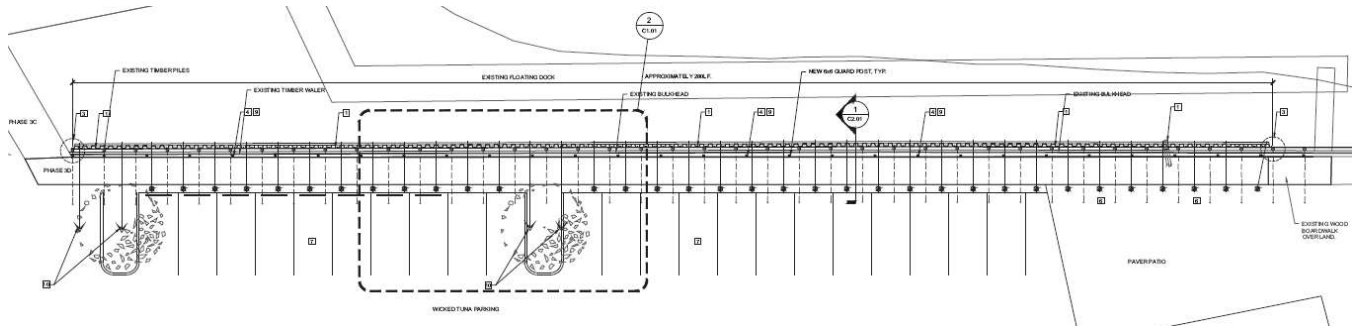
Site Plan of Phase 3D showing location and area of seawall and walkway repair
